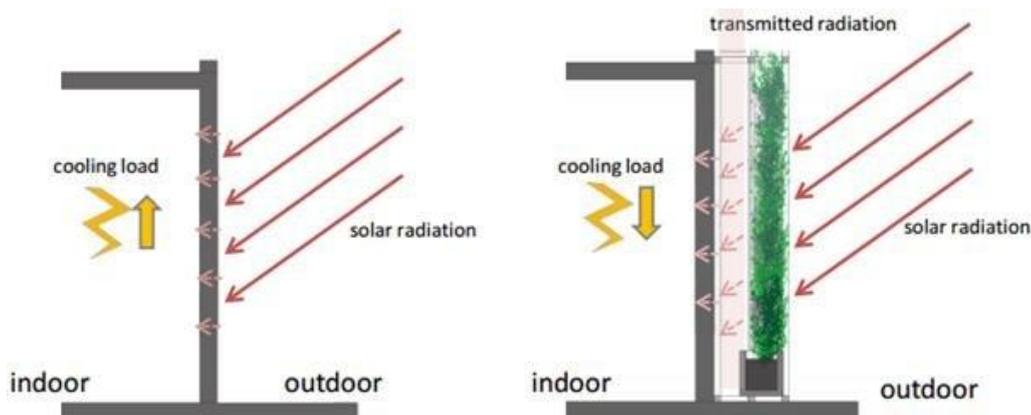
Difference between a conventional wall façade and a green façade. (Hadba, Silva, & Mendonca, 2017)
